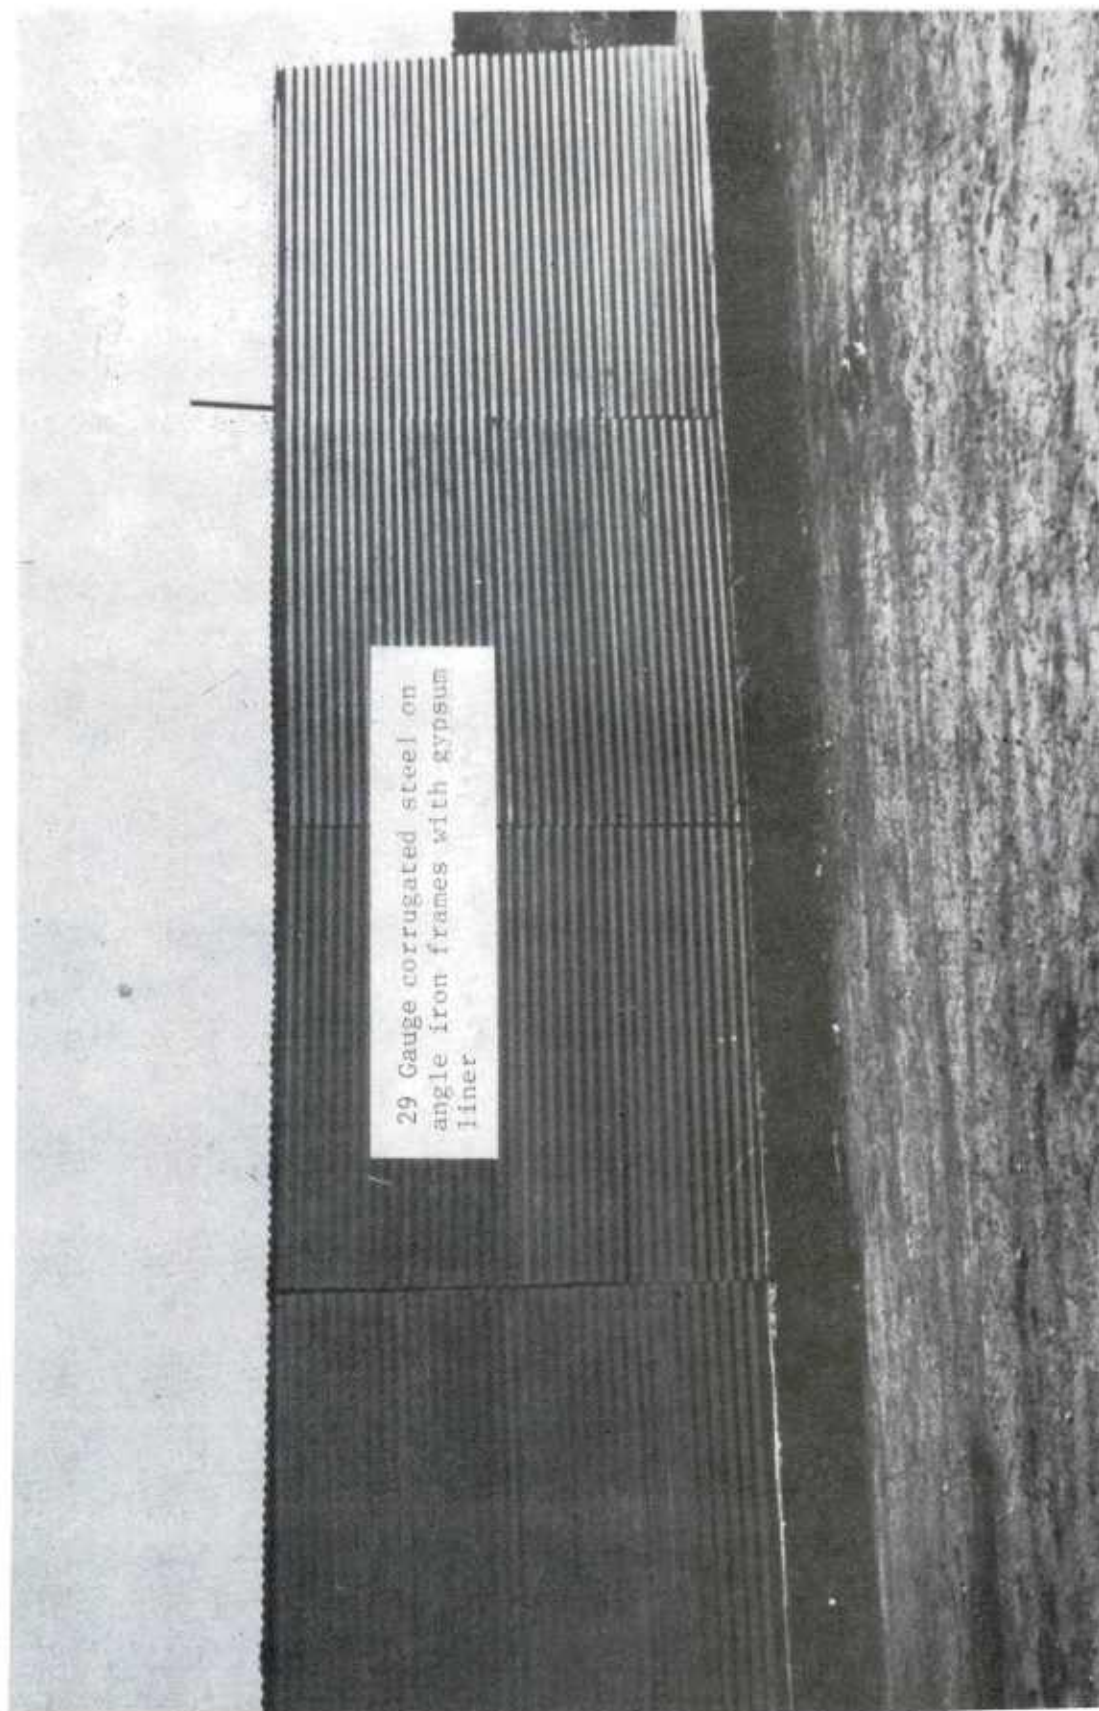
SIDE VIEW OF TUNNEL RAMP
